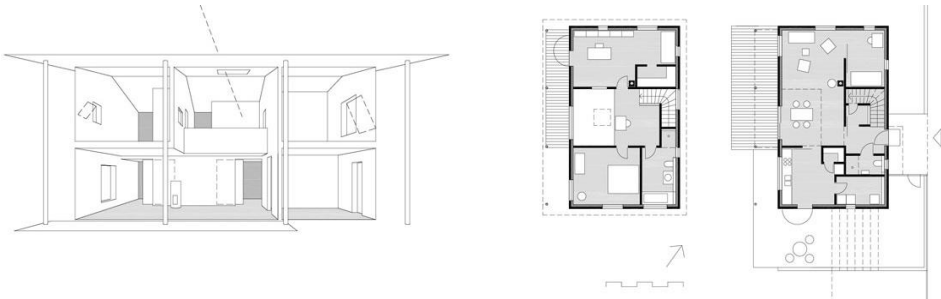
Plan and cross-section of the house, Darmstadt, Germany, the project the company "Schauer + Volhard"
